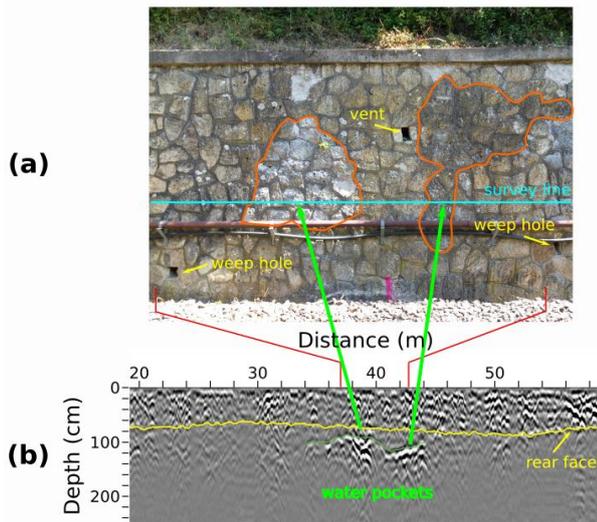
Example of a gravity retaining wall: (a) front face of the inspected wall with two annotated visible patches (orange polygons); (b) corresponding GPR section where voids originating in the backfill can be detected behind the visible patches.
